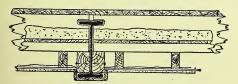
Sound-proof Floor with Pugging and Steel Joists.
